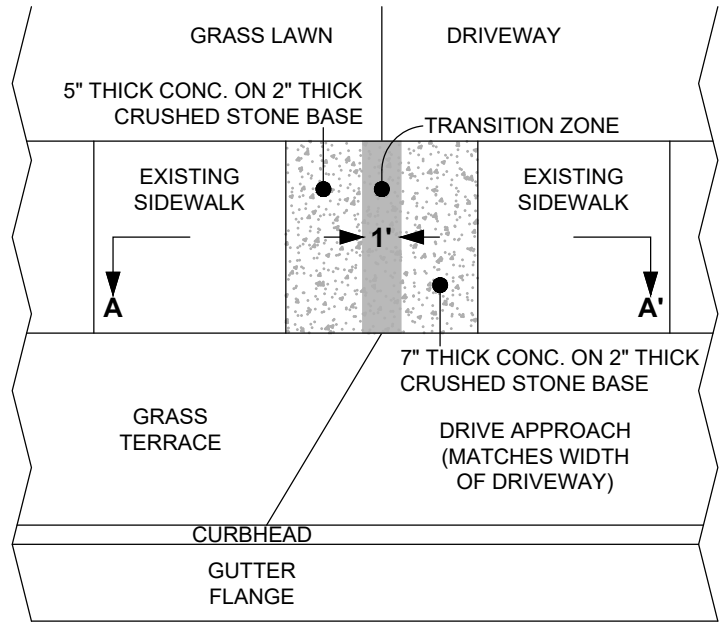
TYPICAL DRIVEWAY & ALLEY
